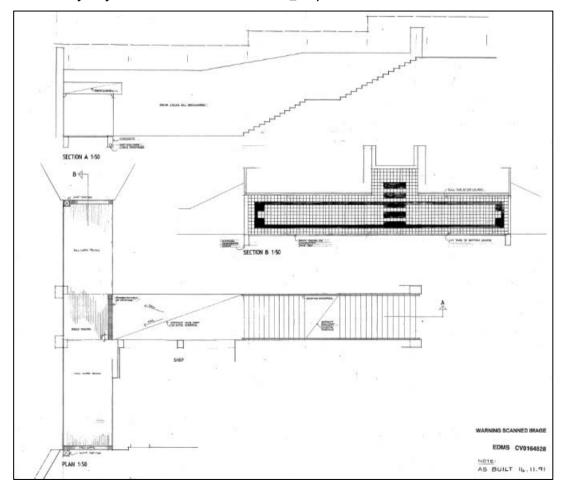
1991 subway alterations plan showing retiling, paving and cleaning (Source: Sydney Trains Plan Room 0164828_AOc)
